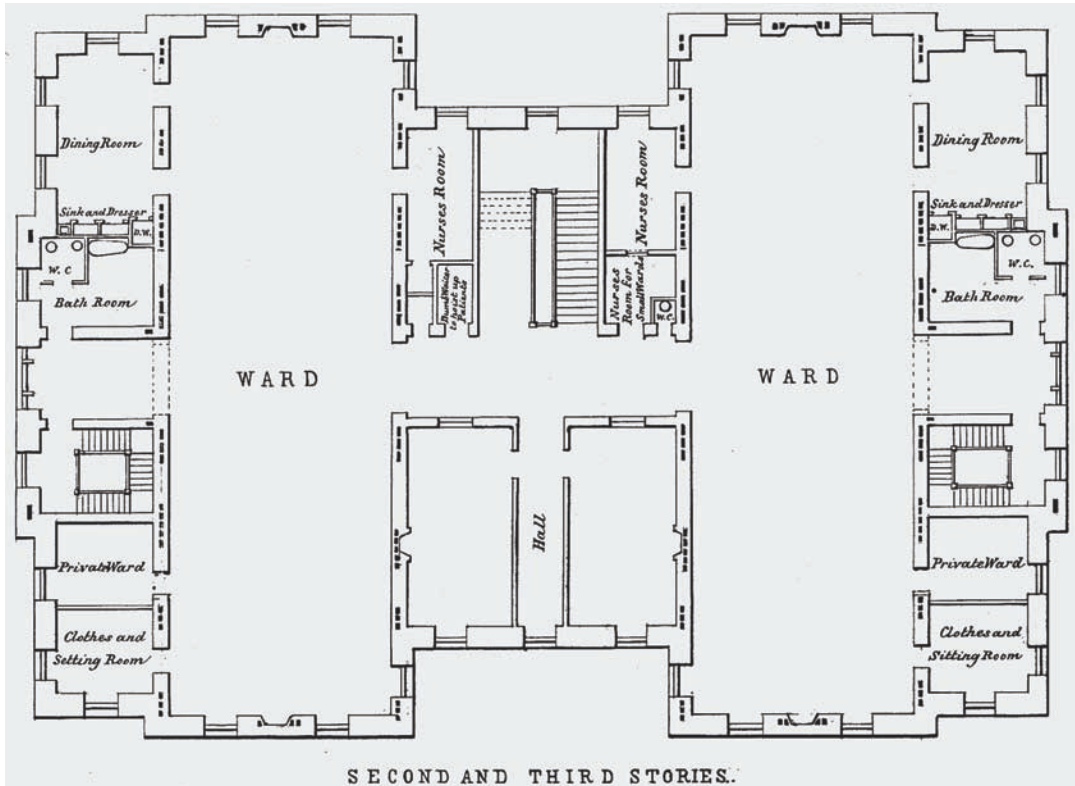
New York Hospital, New York City, plan of new South Building, 1855. The ward ventilation was provided by extensive risers and ducts rather than by windows, allowing the services to be within much greater proximity to the wards and allowing a greater centralization of plan. Built just before the blossoming of pavilion-ward guidelines, the building was soon considered obsolete, if not dangerously poorly ventilated.
